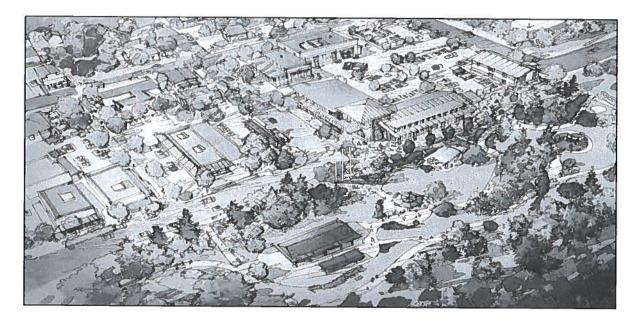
Paradise Recovery Plan, New Civic Center, Illustrative Plan
